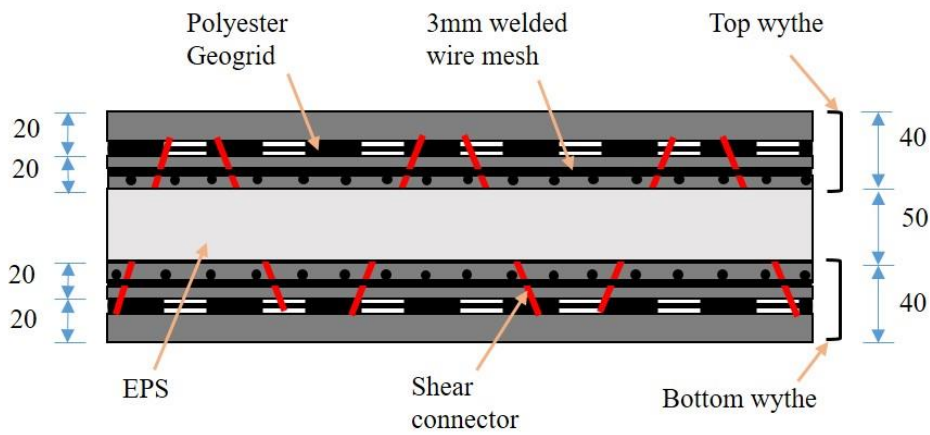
16: Cross-section details of CSP containing polyester biaxial Geogrid
